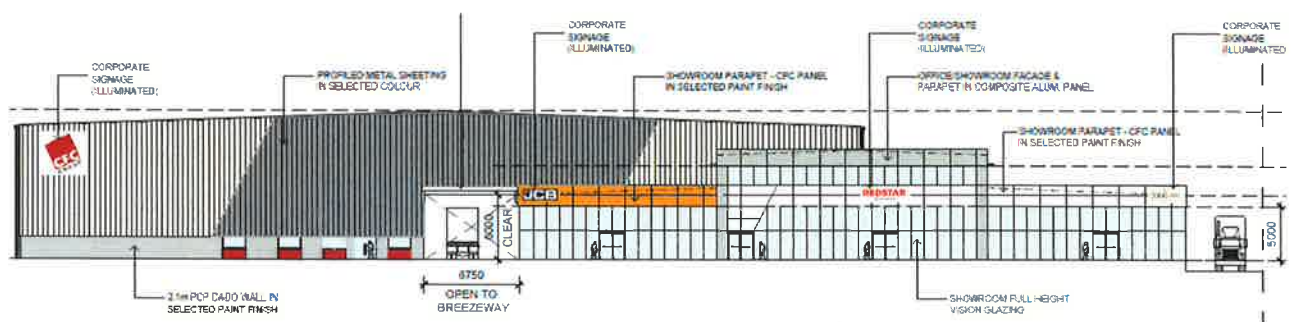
| Proposed Southern Elevation (view from Skyline Crescent)
